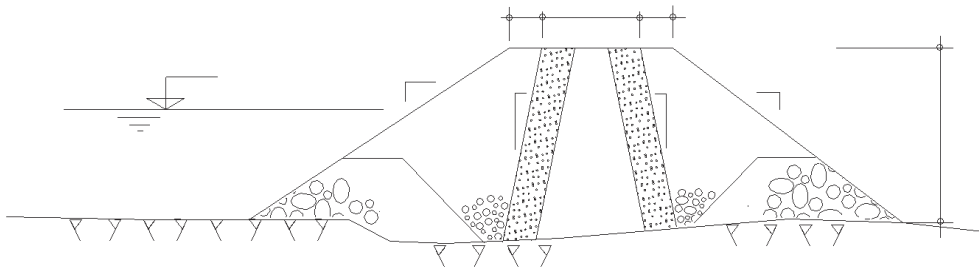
Cross-section of a longitudinal cofferdam.
